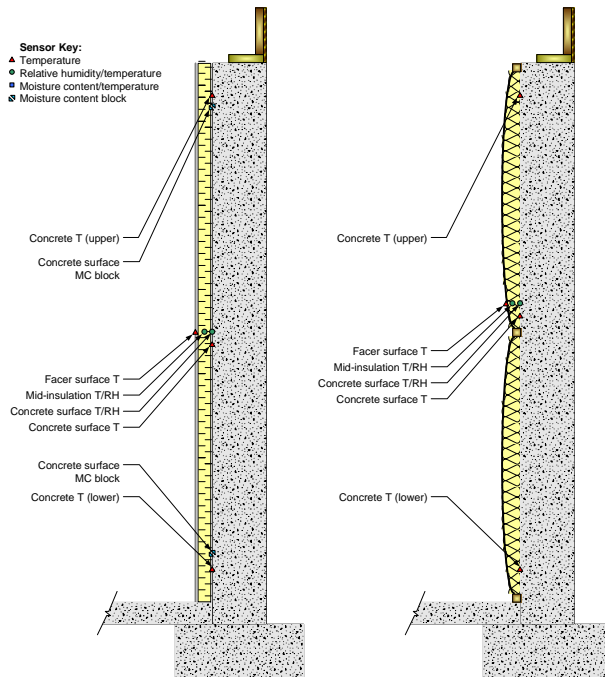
Section and sensor layout for Huntley site walls 7 and 8
